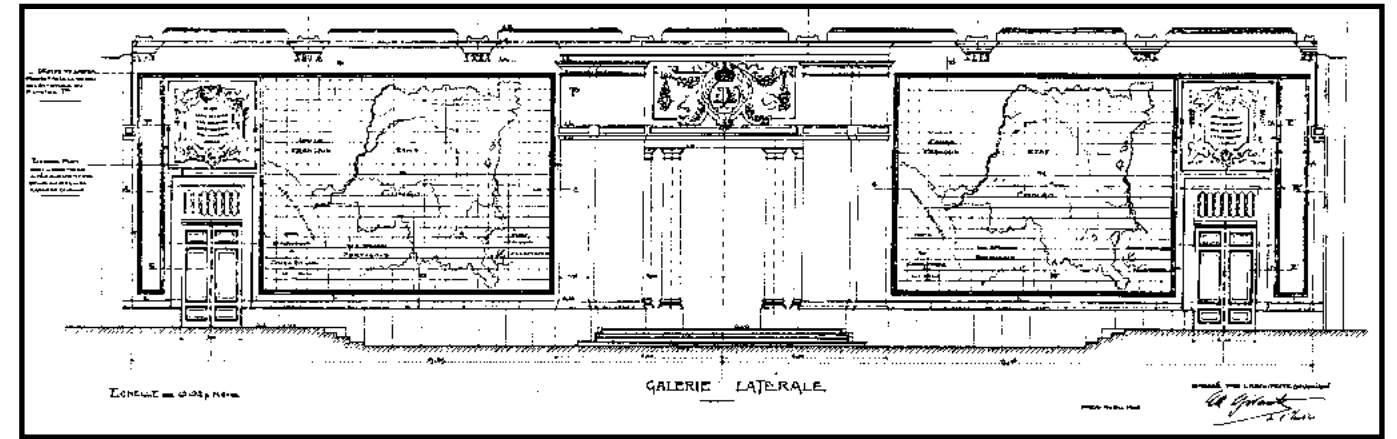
Girault's plan for the wall maps (detail), Fonds Charles Girault, HA.01.0827.27, © RMCA
